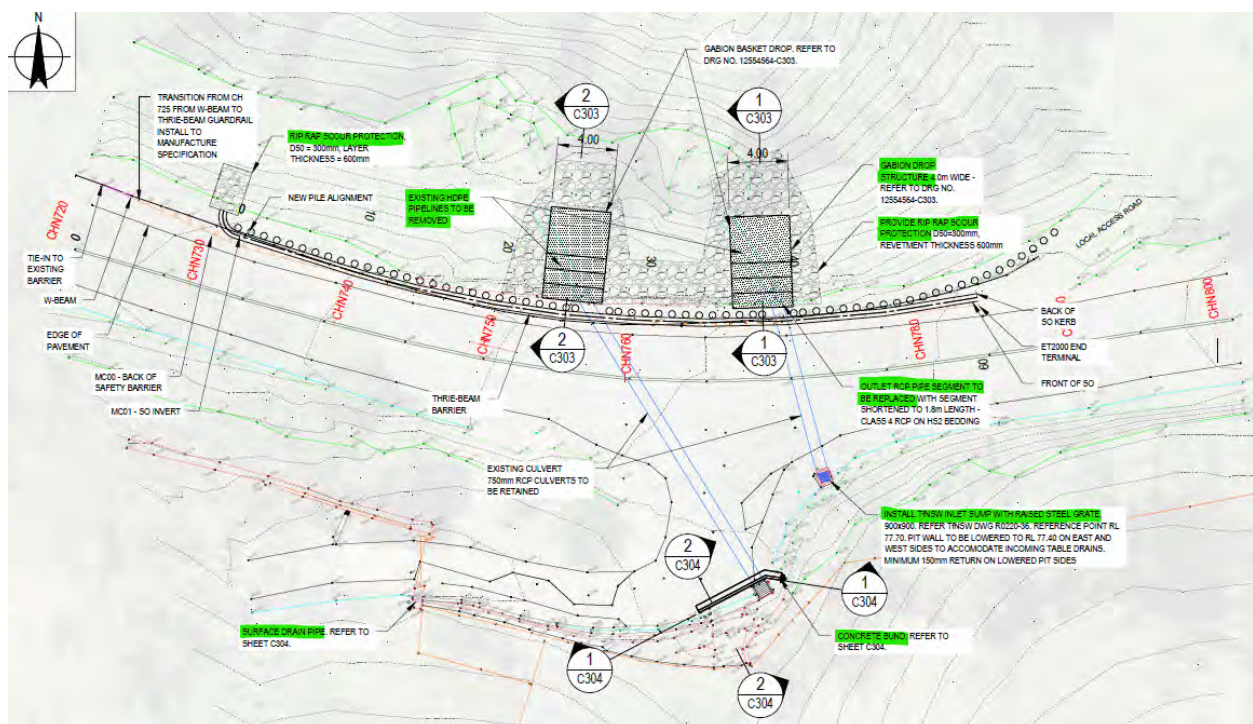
Overview plan – drainage remedial design features (highlighted green)
